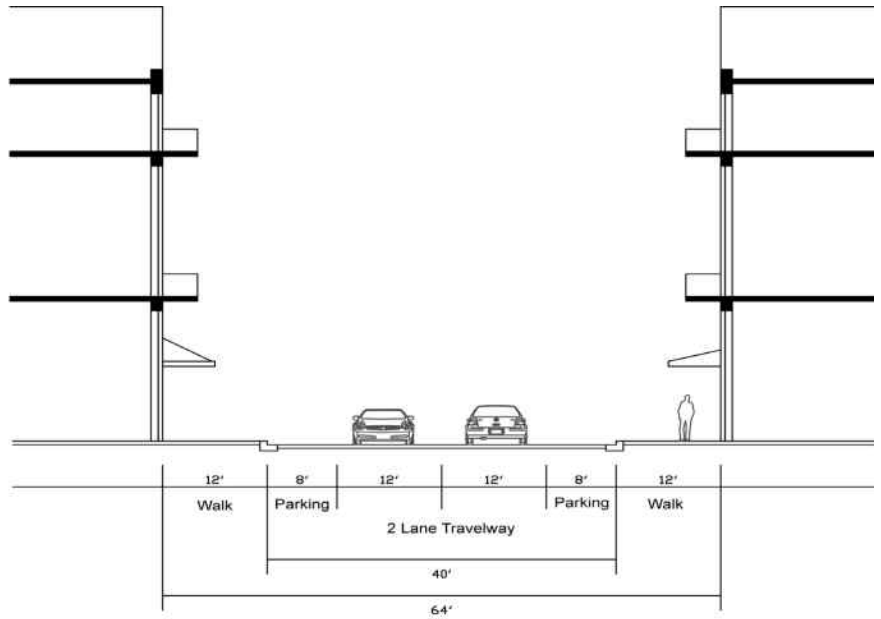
Mixed Use Town Center connector roadway cross-section
